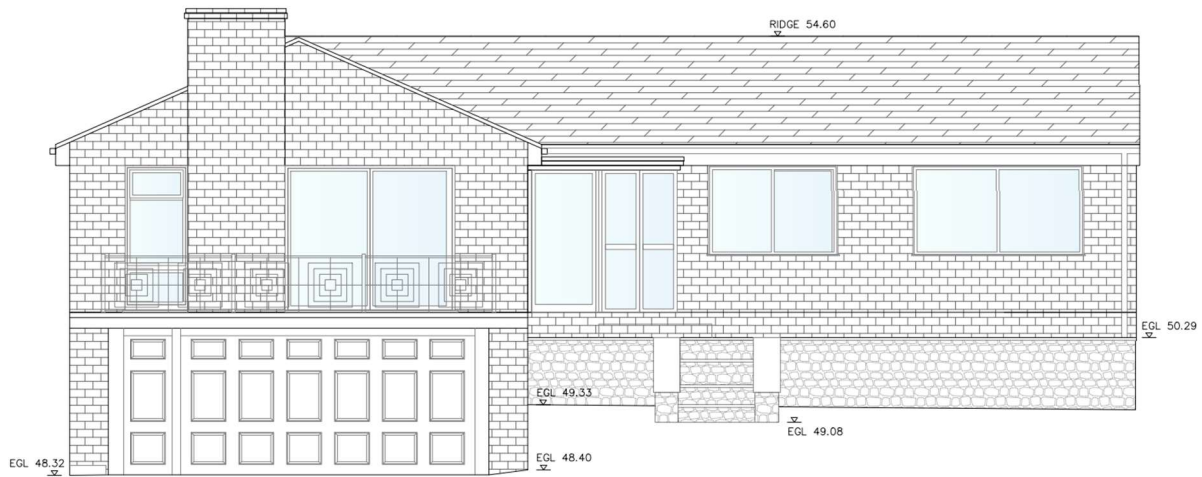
Existing South West Elevation drawing, which is the elevation on the street scene
